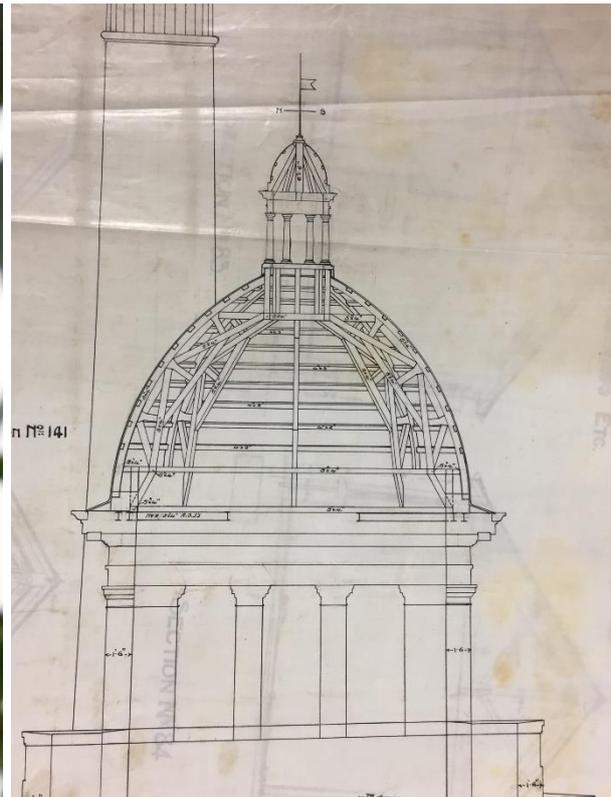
, Water tower roof structure, source: Author's own 2020 (Oatley & Skinner, 1902)
